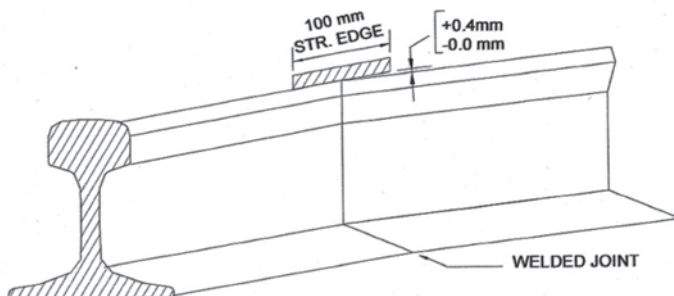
(d) Tolerance for Finishing Top Table Surface of Welded Joint with New Rails
